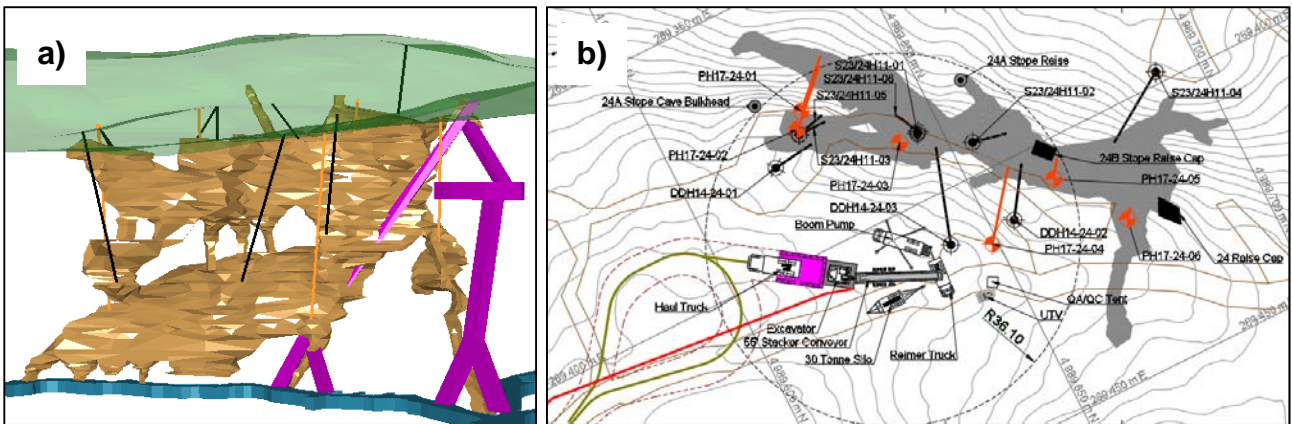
Typical Stope Area: a) Longitudinal view of stope; b) Surface plan of paste production site
